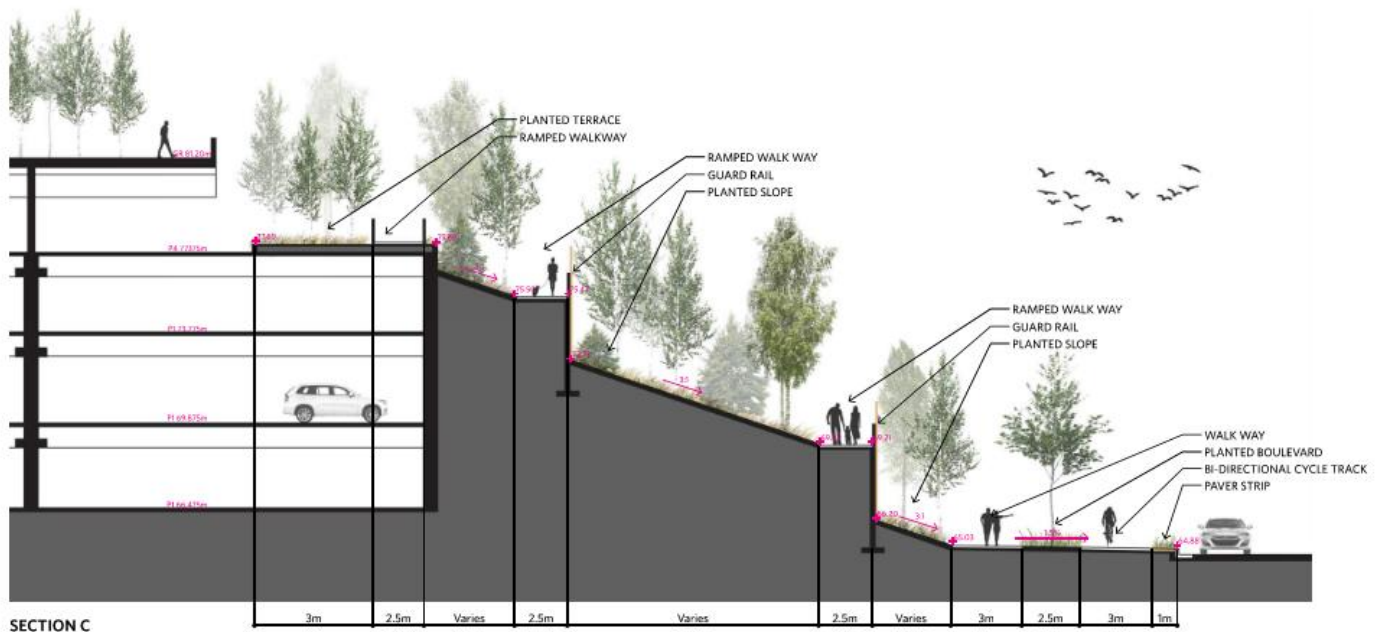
illustrates the folded landscape of the recreational path that connects Preston Street at the corner of Prince of Wales Drive with the Queen Juliana Park on the rooftop. This recreational path is sloped for universal accessibility and will have resting areas along the way up. The earthen embankments are designed to provide deep soil opportunities for trees to give them the best opportunity to thrive and visually screen the Parking Garage over time.
